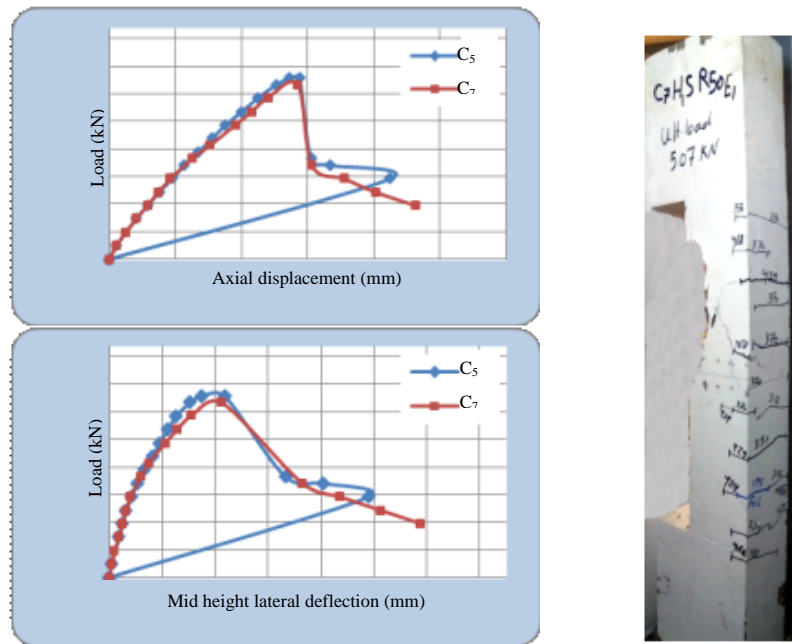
a) Load-deflection of specimen C₇ and b) Crack pattern of C₇
